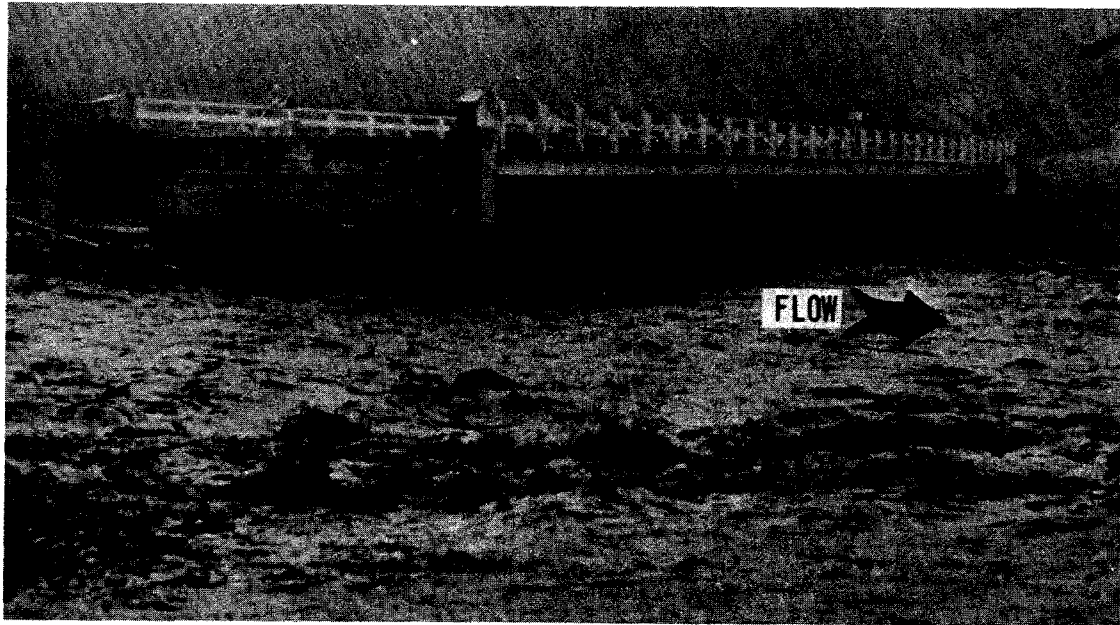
View of SR-1 bridge at Moose Creek after failure of right approach embankment. (From Norman, 1975.)
